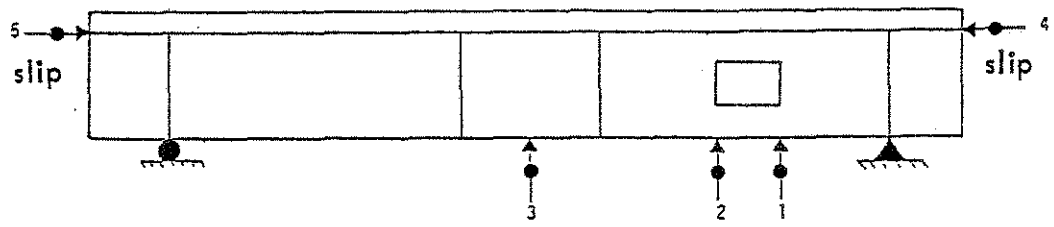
Deflection Gage Locations for Beams No. 1, 2, and 3
